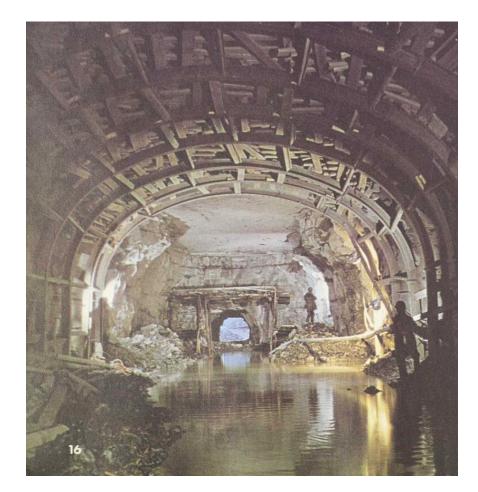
Two-track Montreal Metro tunnel revealing the limestone formation that spans the island. Excavation was done primarily on cityowned land and avoided interruption to conditions above ground.
